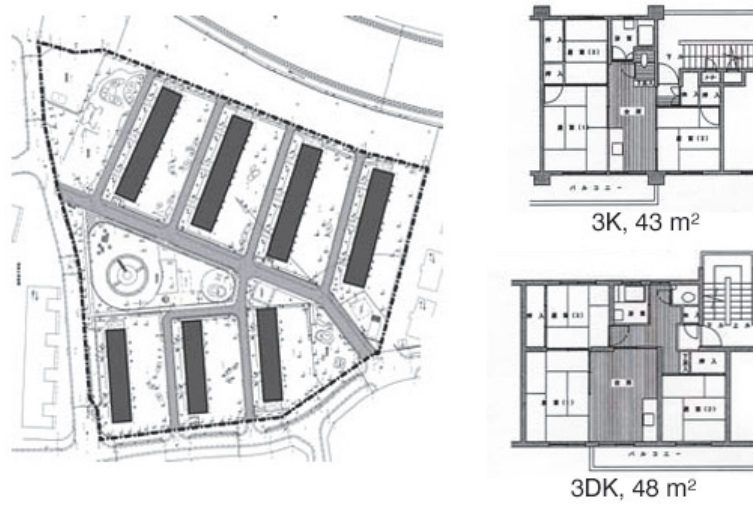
Master plan and two dwelling unit types in Kokuryo Housing before reconstruction
